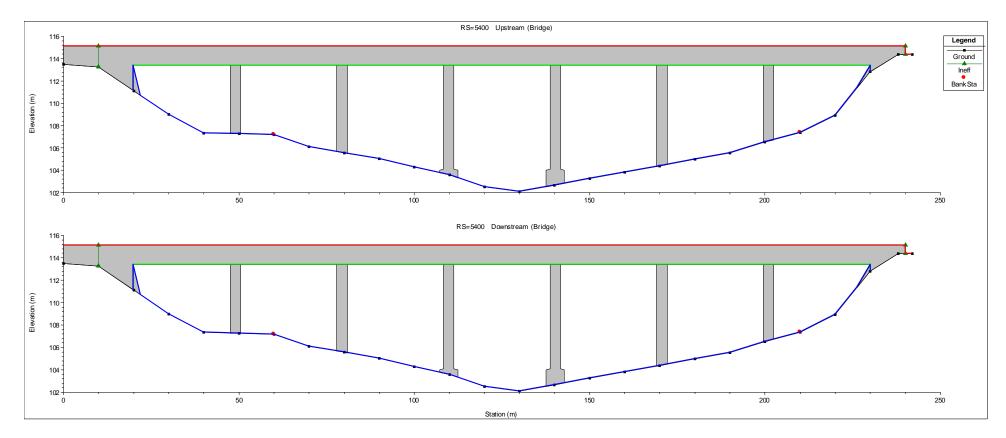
Modelled Daliganj Bridge at chainage 5400 m
